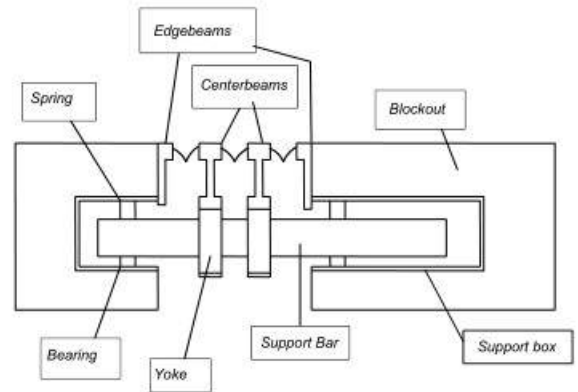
Cross-Section View of Typical SSB MBJS Showing Multiple Centerbeams with Yokes Sliding on a Single Support Bar
